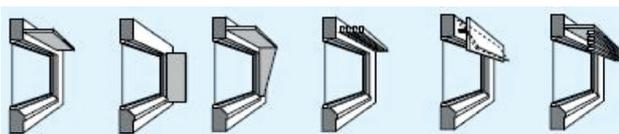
Fixed shading elements used outdoors (Stack et. al., 2002)
